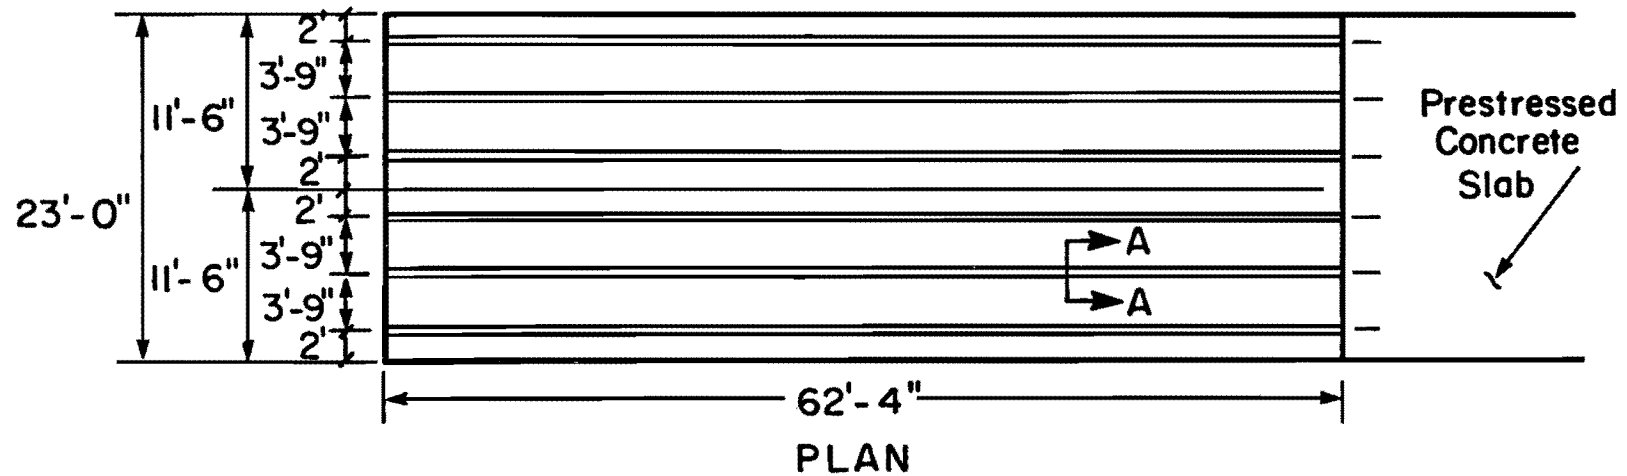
Abutment for prestressed pavement at Zwartberg-Meeuwen, Belgium (Ref 56).
